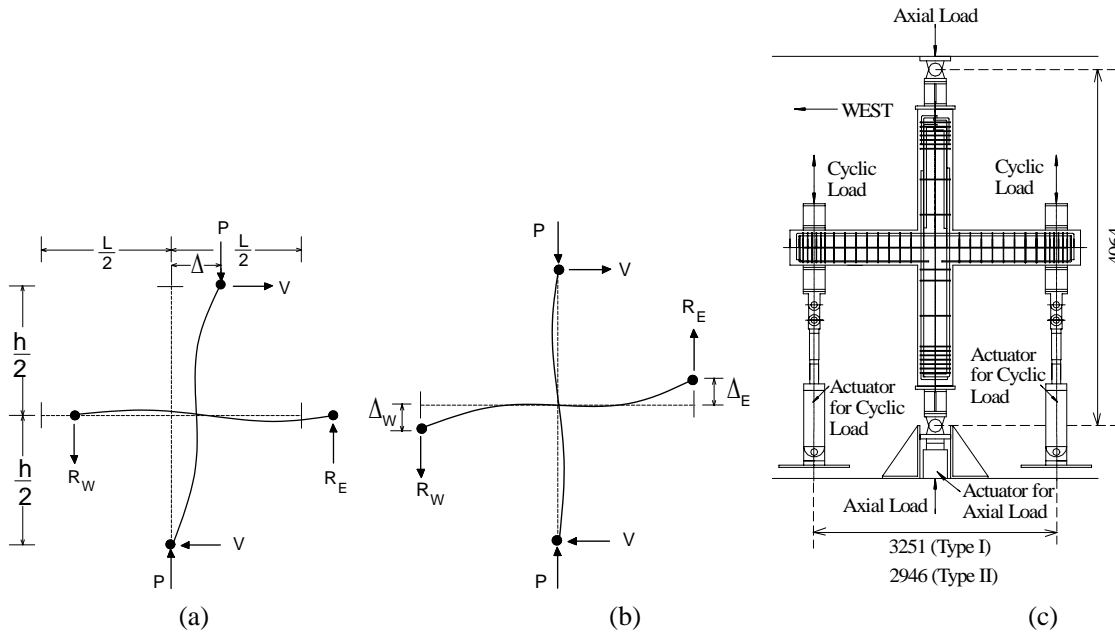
(a) Idealized deflected shape of beam-column joint, (b) joint tested in the laboratory, (c) test setup.
